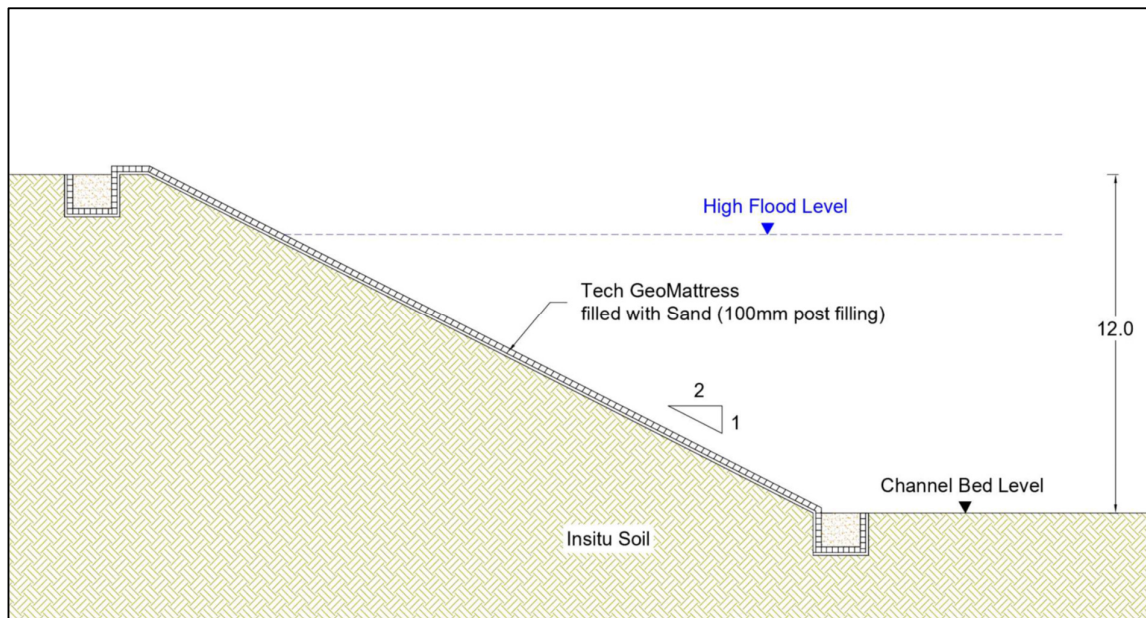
Proposed cross-section of river bank protection with Sand filled Geotextile Mattress on the levelled surface showing top trench and bottom trench
